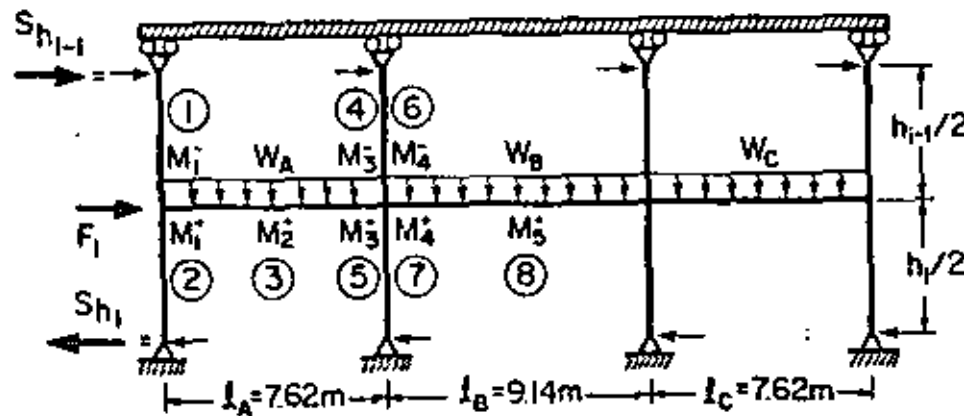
SUBASSEMBLY FOR PRELIMINARY DESIGN
